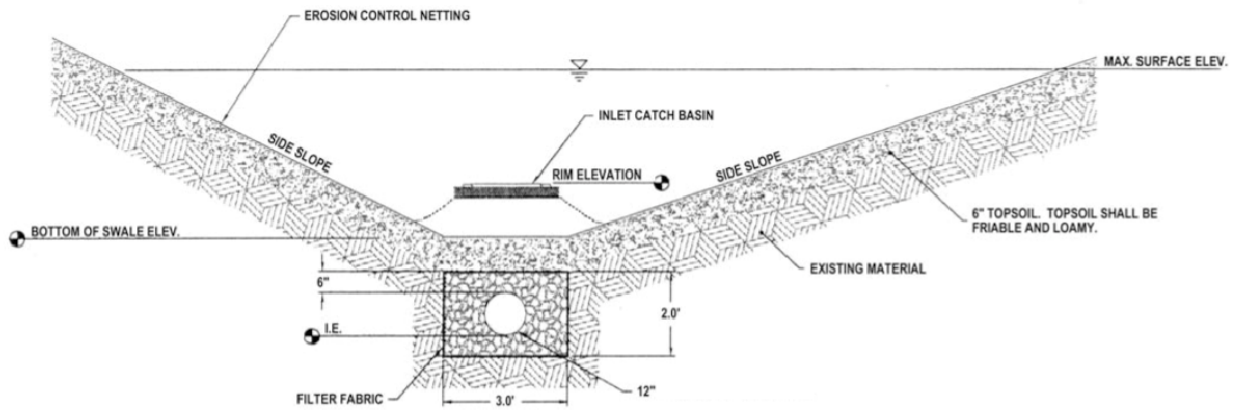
Typical infiltration trench with distribution pipe (Source: WSDOE, 2004a, p. 6-36)
